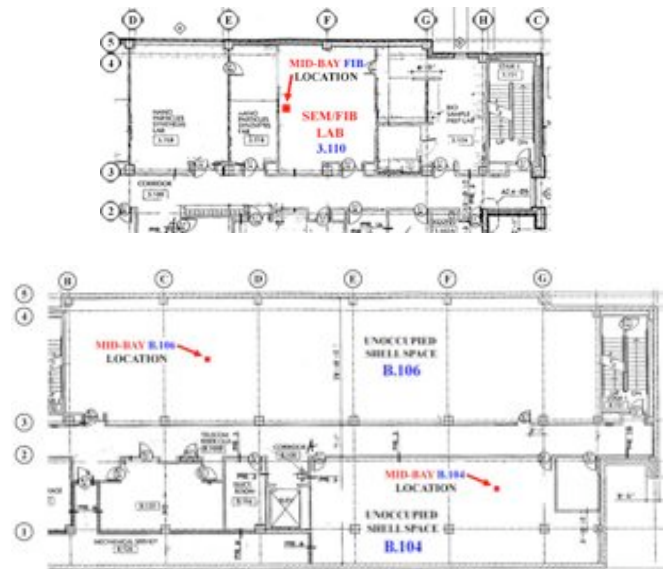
A & B. Basement and 3rd Floor Lab Plans with Post-Occupancy Measurement Locations.
